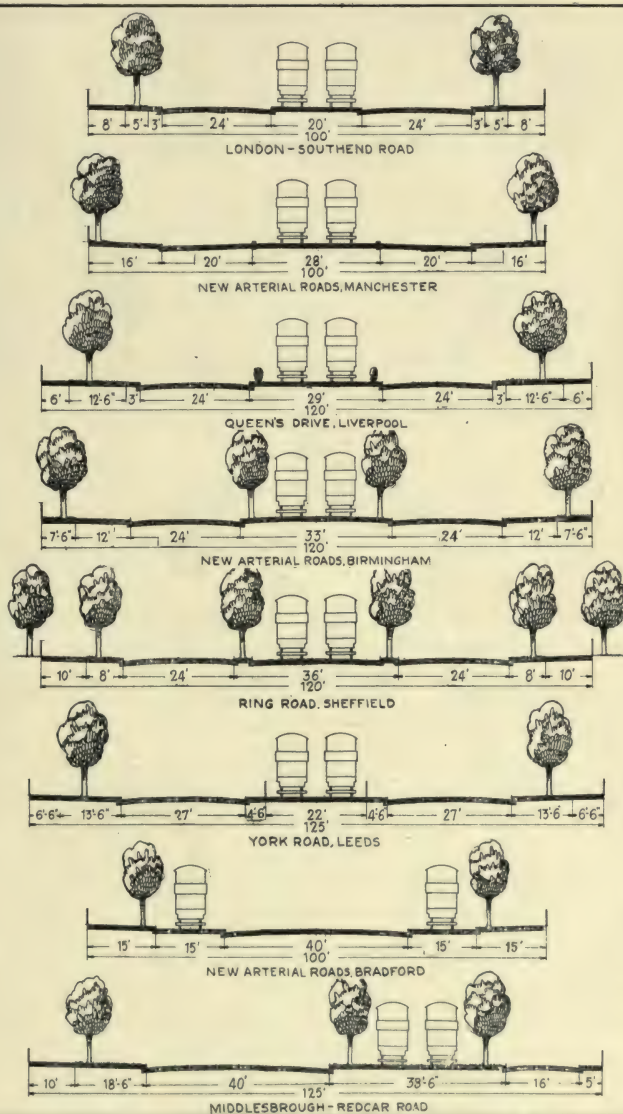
Diagram illustrating the Cross-sections adopted for Arterial Roads at present under construction.
